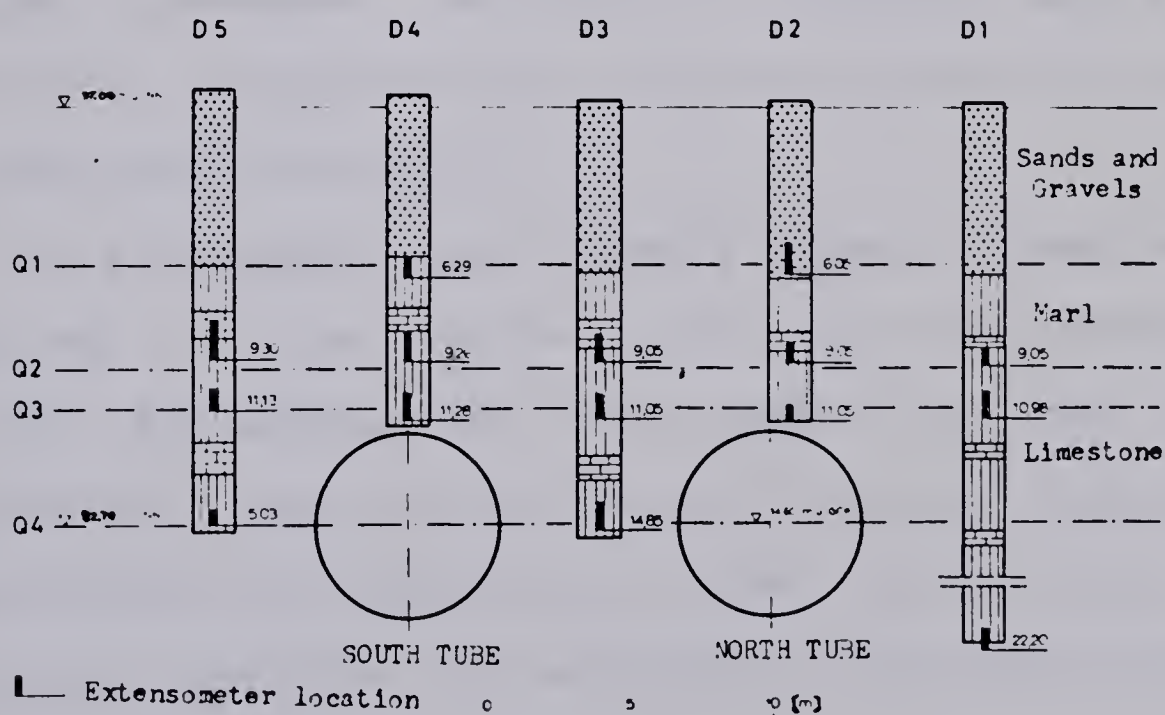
Schematic cross-section of Frankfurt Baulos 25 experimental section (both figures modified from Chambosse, 1972)
